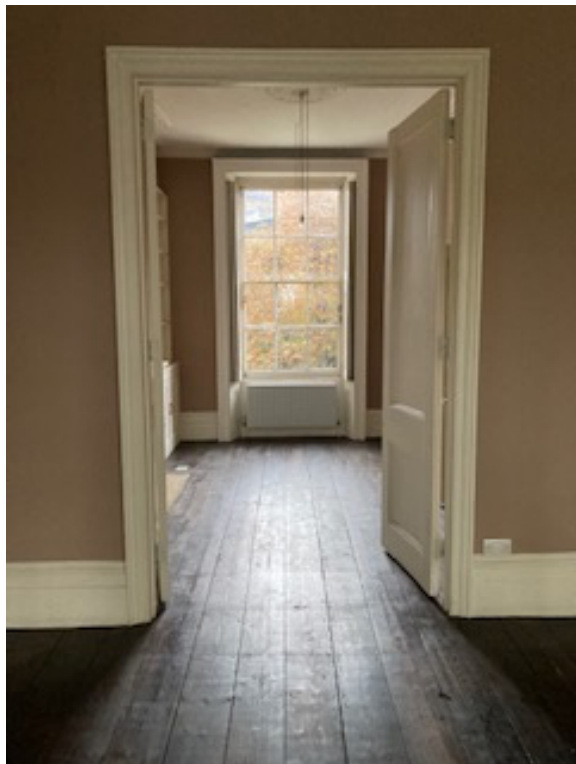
(left): The first floor front room. Figure 7 (right): The opening between front and rear first floor rooms.
